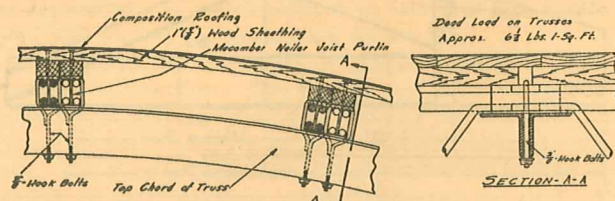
1" (7/8") Wood Sheathing on Nailor Joists
